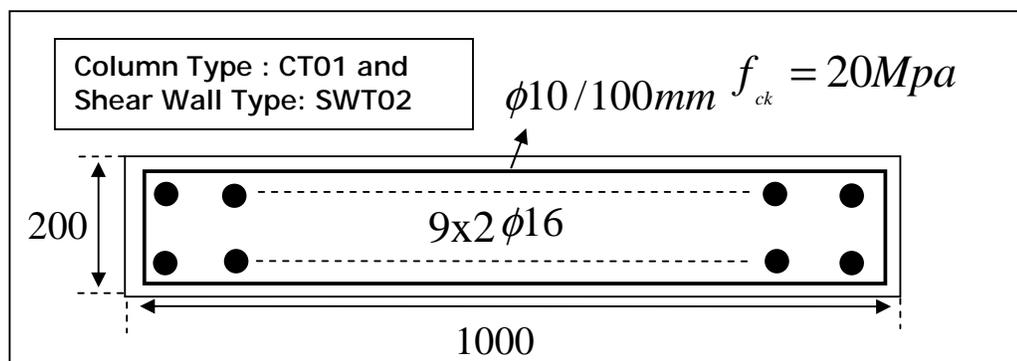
Details of Column Type CT01 & Shear Wall Type SWT02
